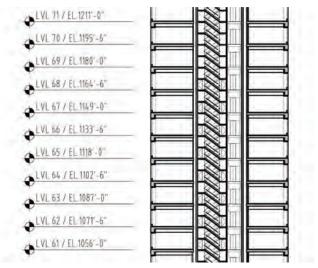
Partial Elevation of 432 Park Avenue Illustrating Scissor Stairs (Source: CIM Group & Macklowe Properties).
